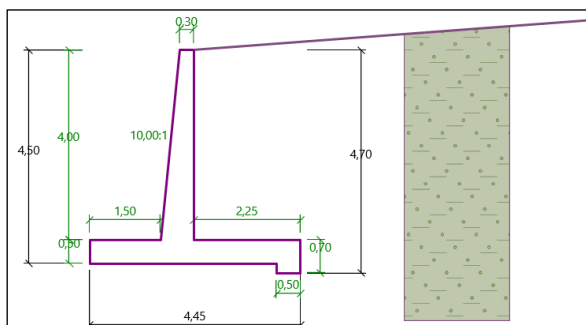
Planning of a retaining wall with a cantilever wall type at location point 4
